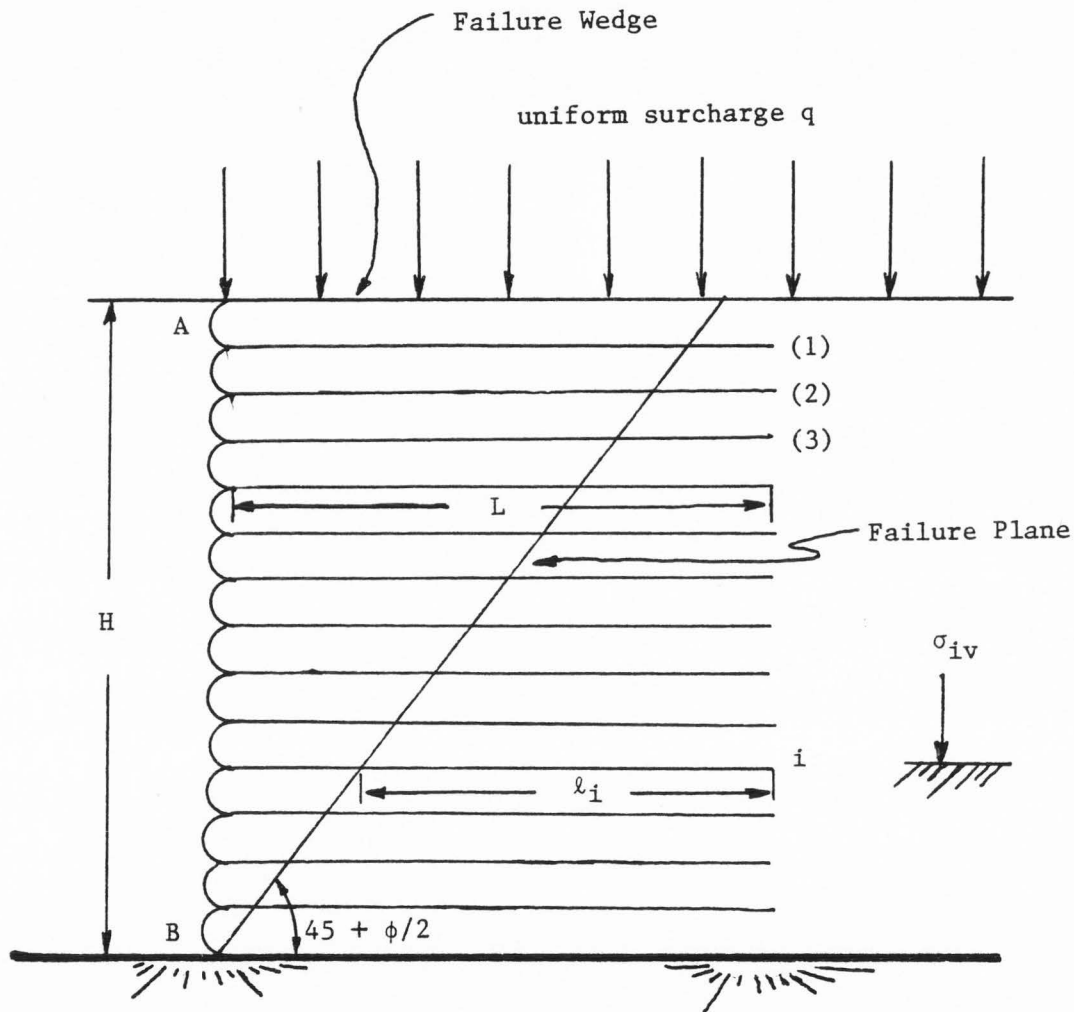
Cross-section of reinforced earth wall showing symbols and dimensions used in analysis.
